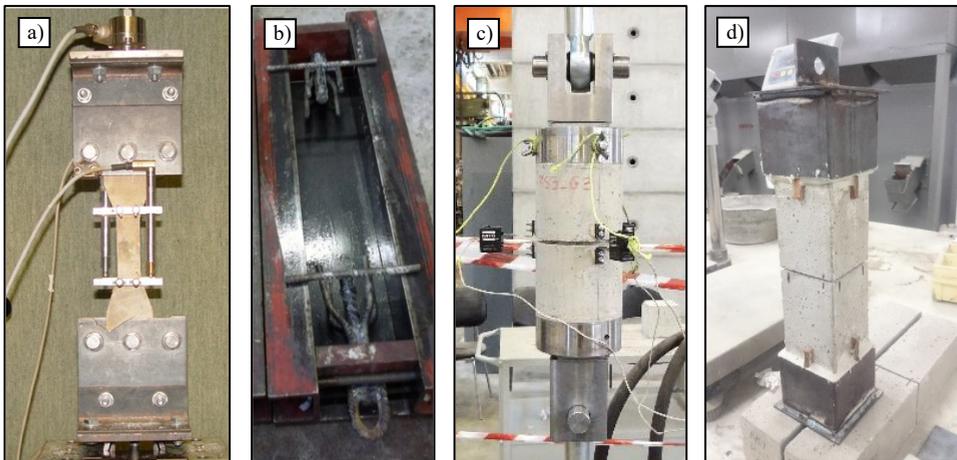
Systems developed to affix steel frames to specimens: a) dog-bones, b) cast anchor in prismatic specimens, c) glued steel frames with epoxy in cylindrical cores and d) glued with epoxy steel frames in prismatic specimens.
